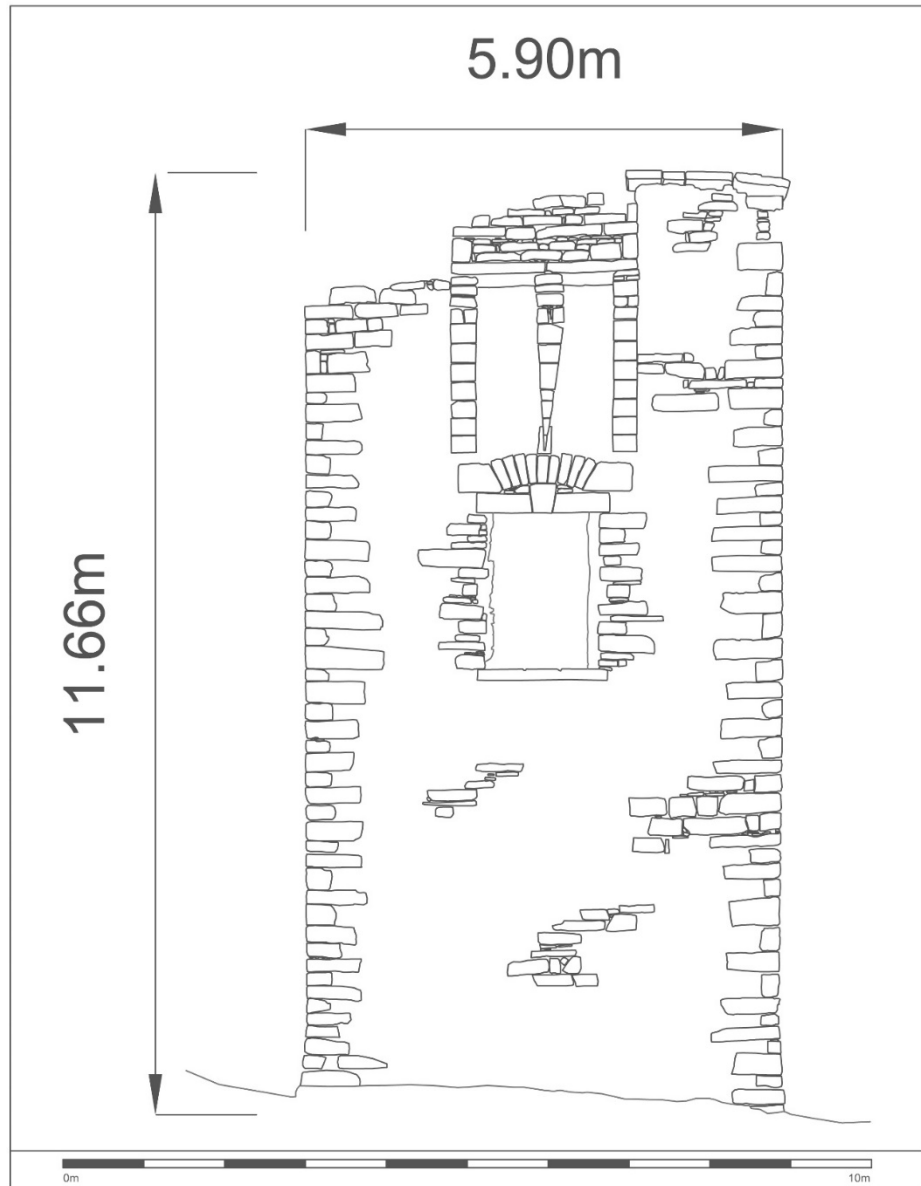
External elevation of the south-east wall at Carrigan Head Signal Station.
